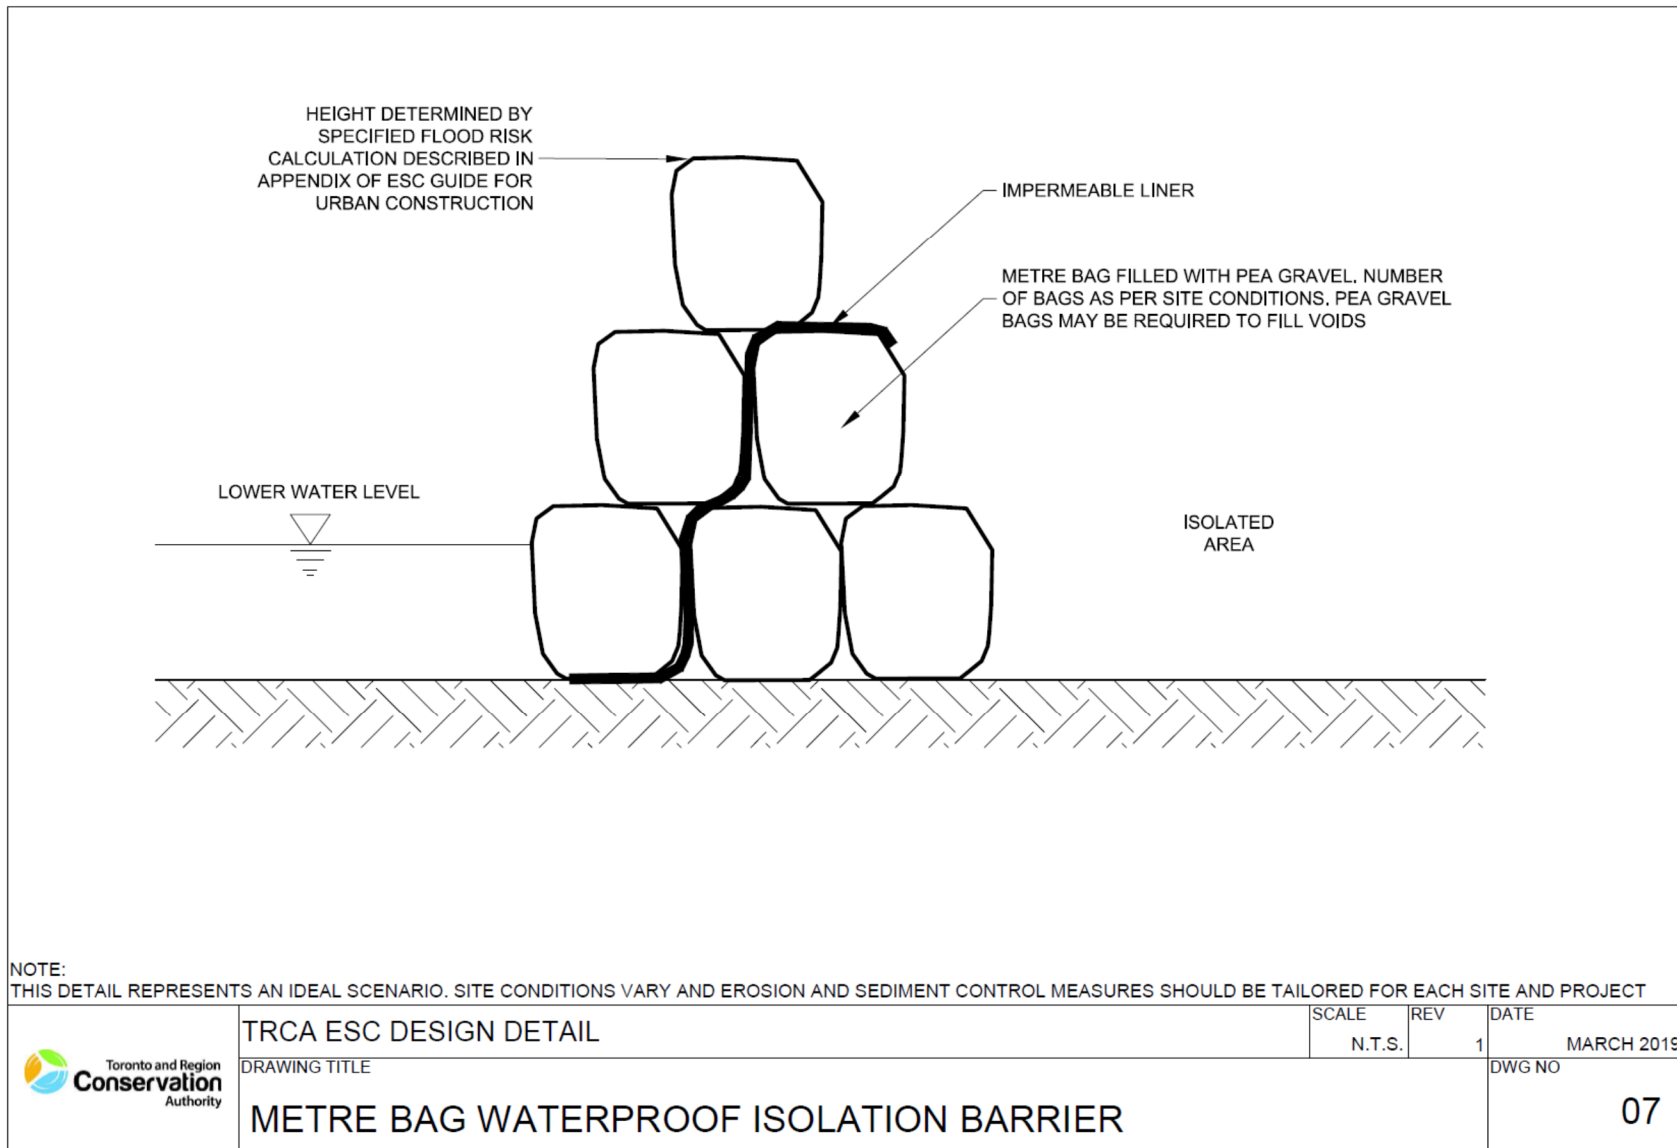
Design detail for waterproof isolation barrier constructed using metre bags
